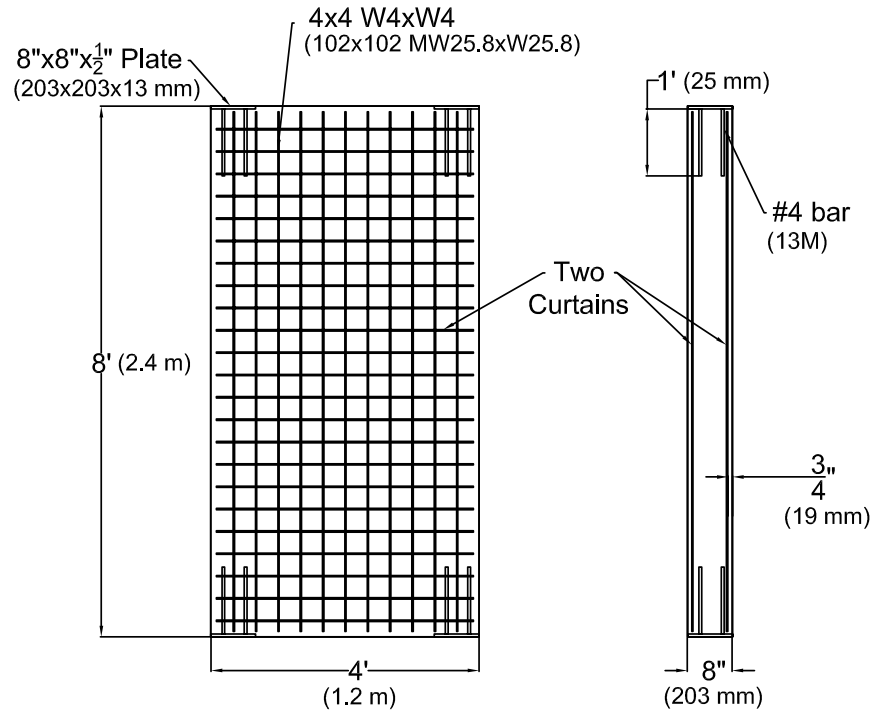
Individual concrete wall panel dimensions and reinforcement details.
